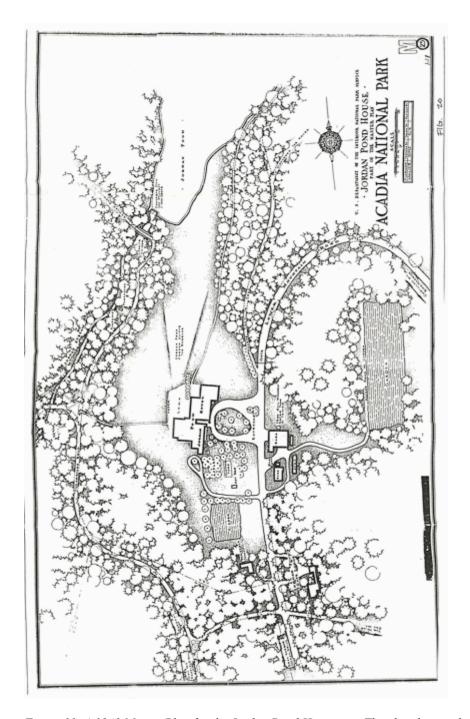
A 1940 Master Plan for the Jordan Pond House site. The plan depicts the circulation systems, vegetation, buildings, natural systems, and small scale features found in the area (Acadia NP archives).
